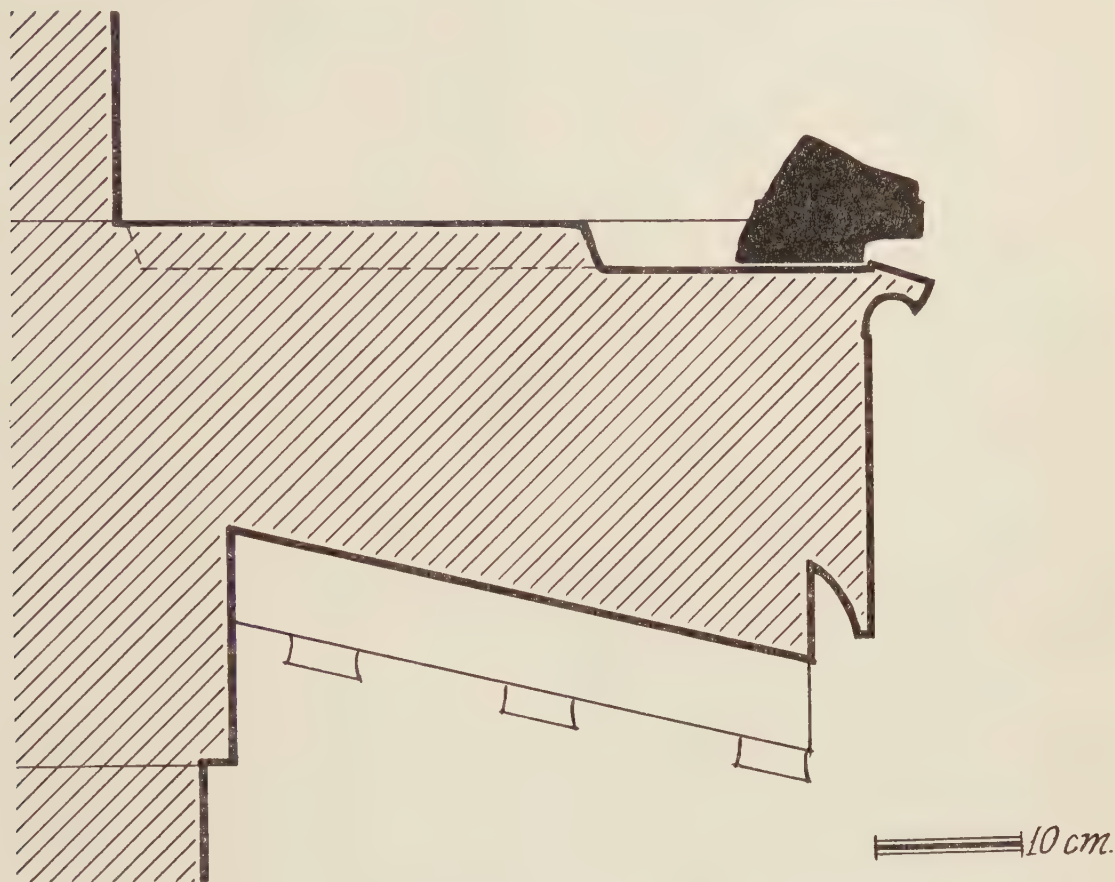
Section through Floor of West Pediment with Fragment E in Place (Scale 1:10)
